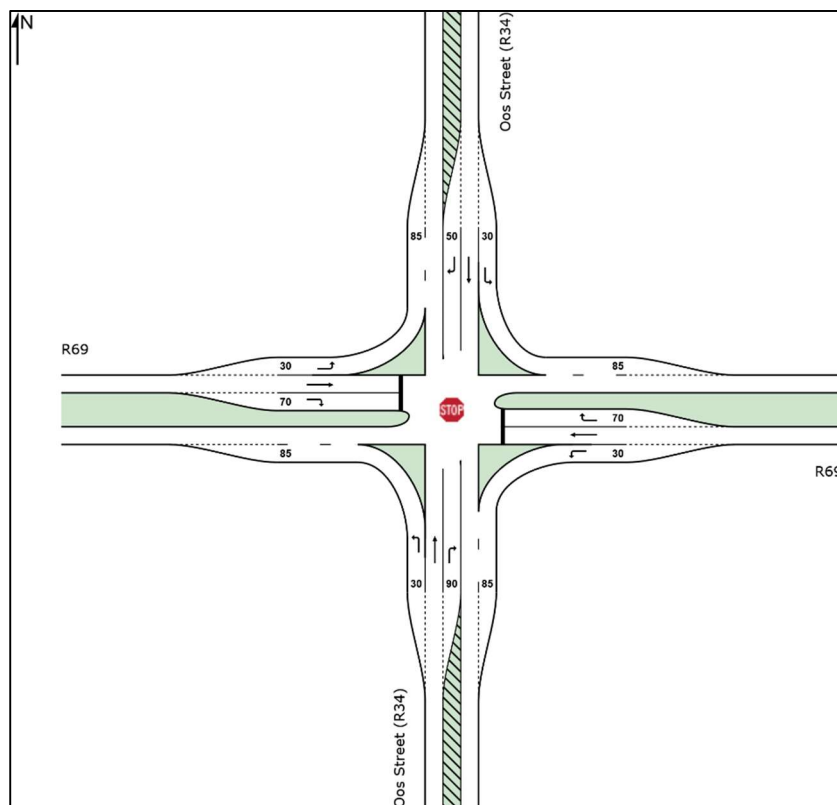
Oos Street (R34) and R69 - Existing Layout
